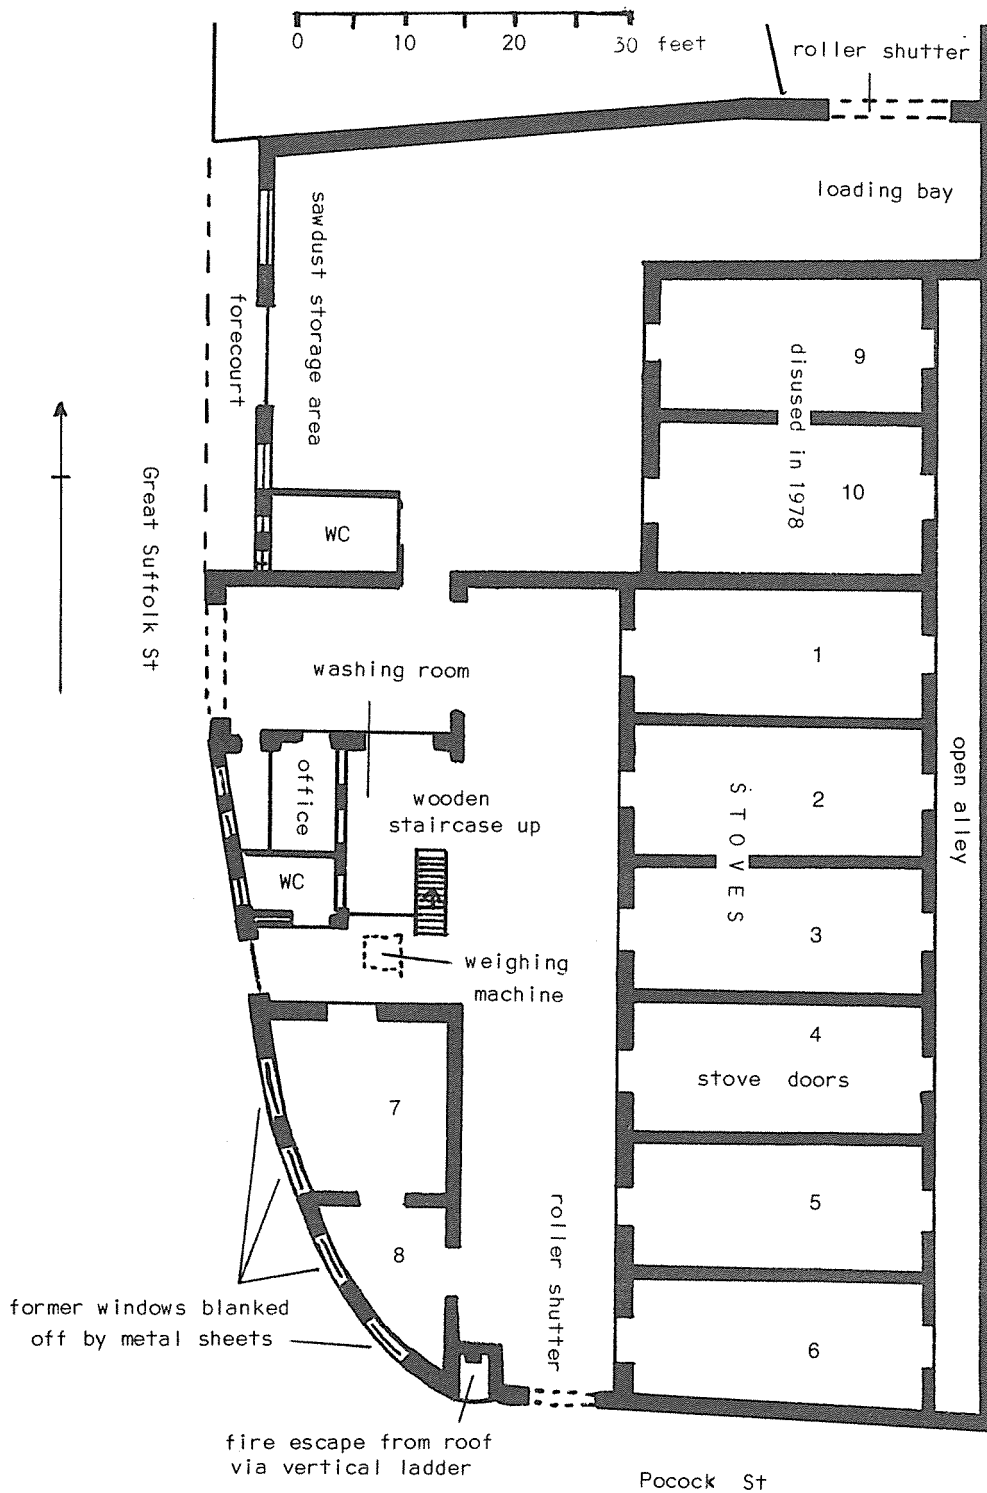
Ground floor plan. The wall thicknesses are slightly exaggerated. Stoves 1 - 6 were those built in 1914, 7 & 8 added in 1926, 9 & 10 added in former No. 57 in 1950
